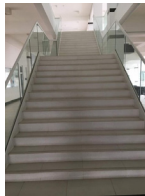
Stairs to the lecture hall with no tack tiles and handrail with existing height is 390 mm
